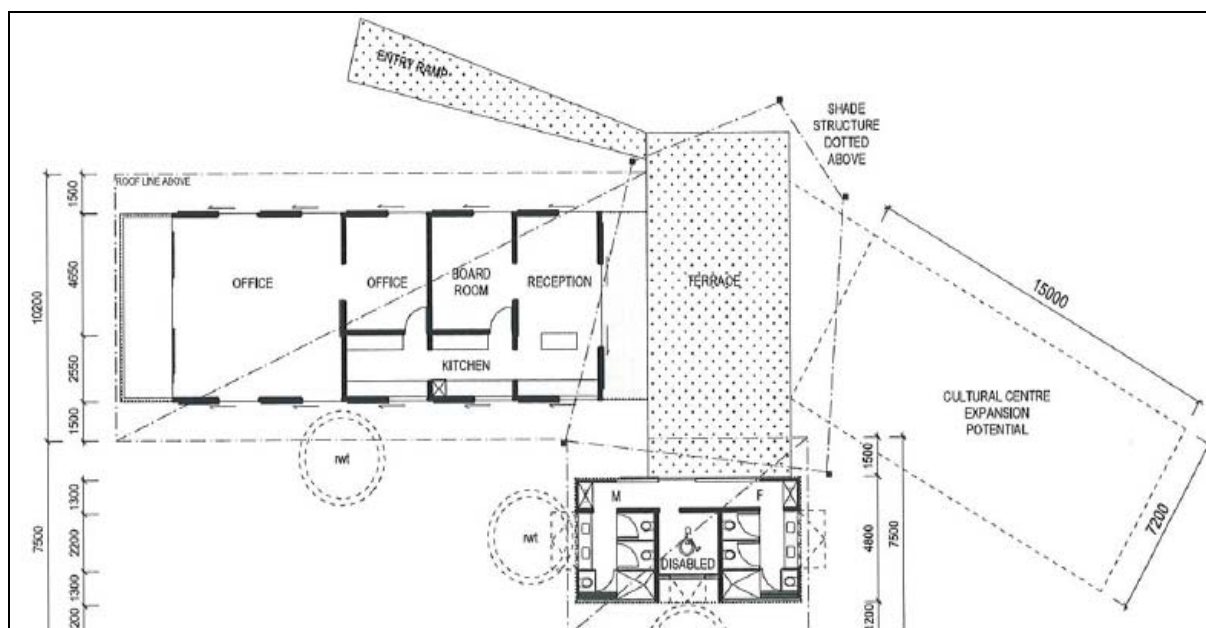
Administration Building Floor Plan (source: Environmental Assessment)
